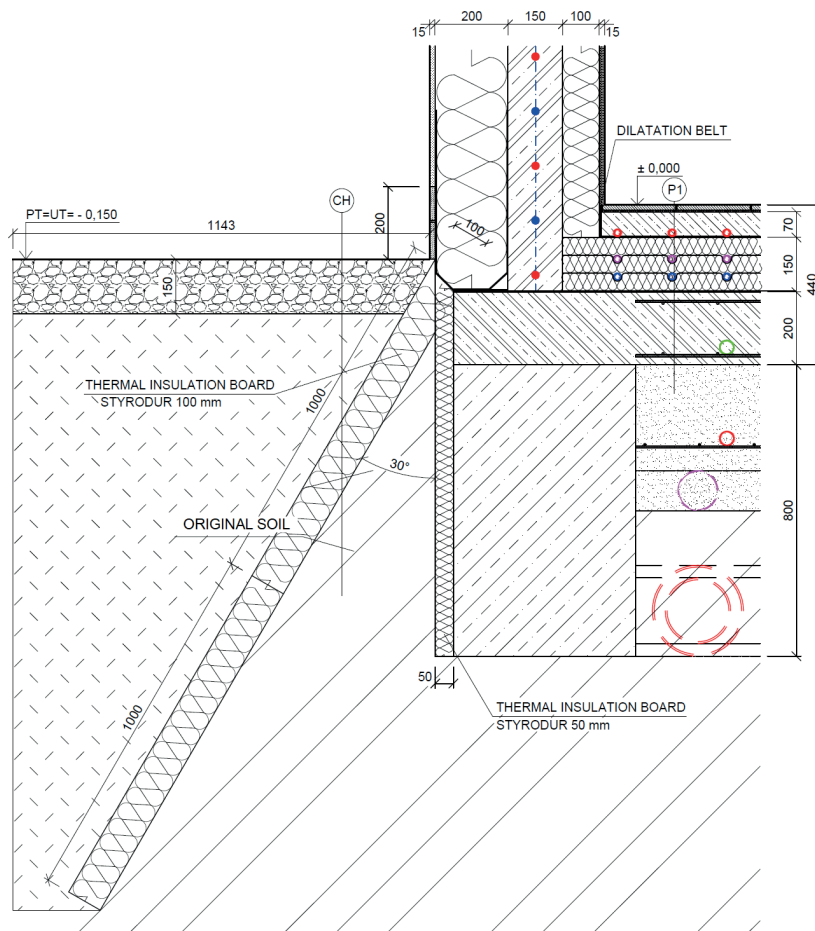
Detail of the construction solution of the ground heat storage thermal insulation [2]
